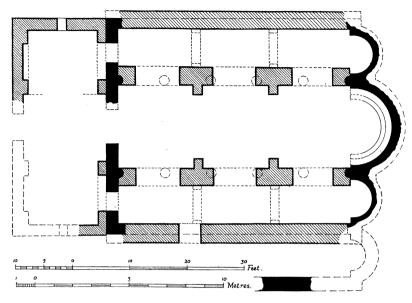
SYKHA, PANAYIA. PLAN (scale 1/200).
